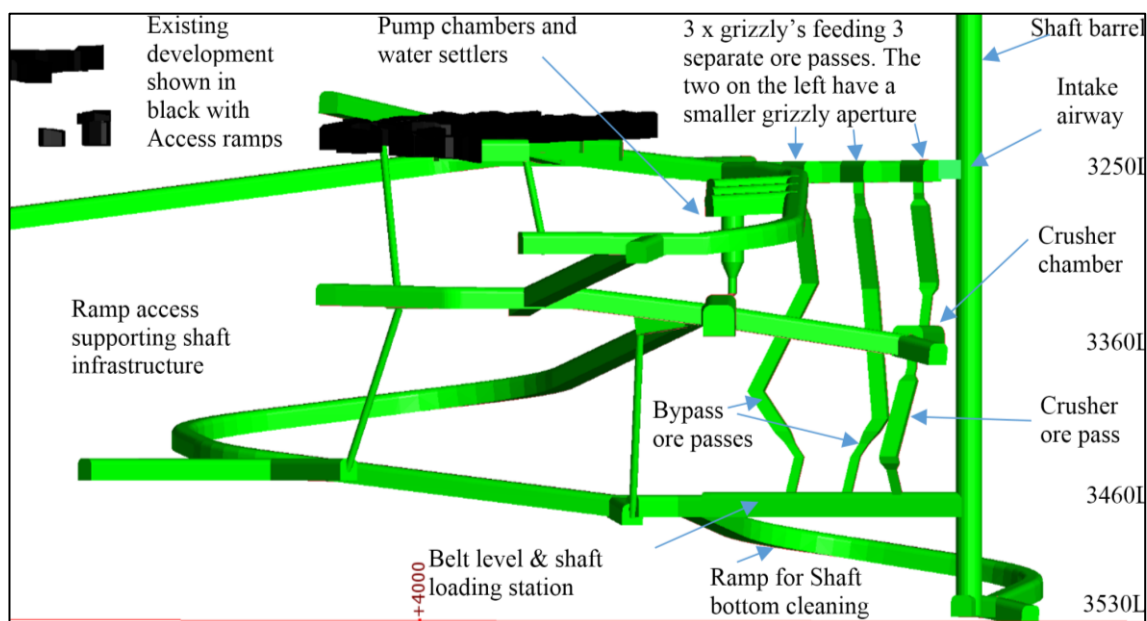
View of the bottom of the of the proposed subvertical No. 8 shaft, looking east
